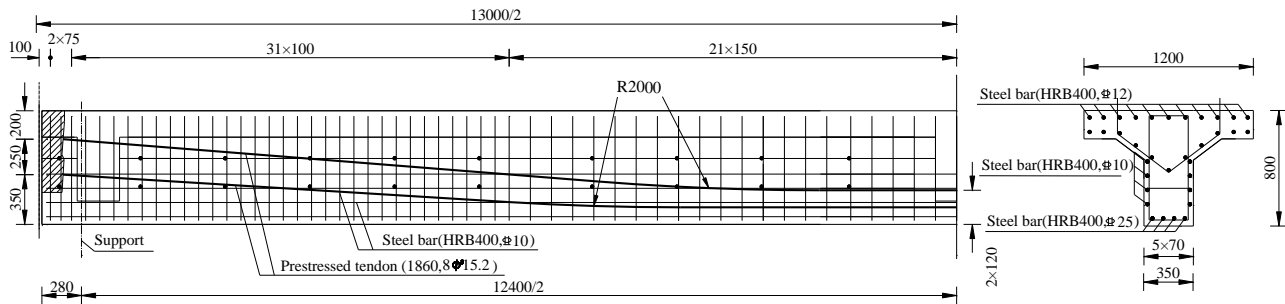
Geometric dimension and steel bar layout of the experimental beam (mm)
